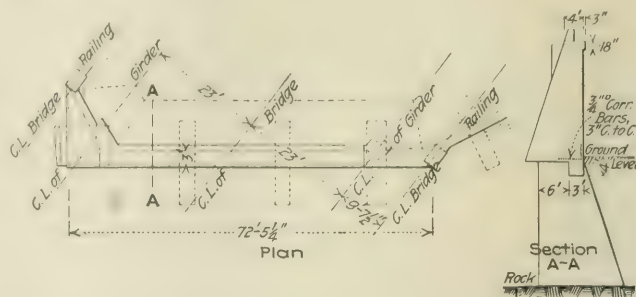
INDIVIDUAL PIER FOUNDATIONS OF ABUTMENT CARRIED TO ROCK
